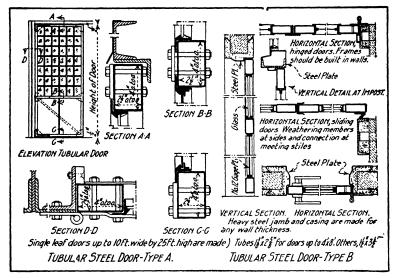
DETAILS OF "LUPTON" TUBULAR STEEL DOORS.
